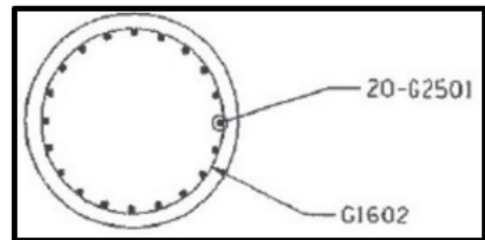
illustrates the connection details used in the Lafayette Bridge of Minnesota, which involves rebars for the connection. On the other hand, Figure 3.11 presents the connection details adopted by the Hastings Bridge, which utilizes shear studs for the connection.
